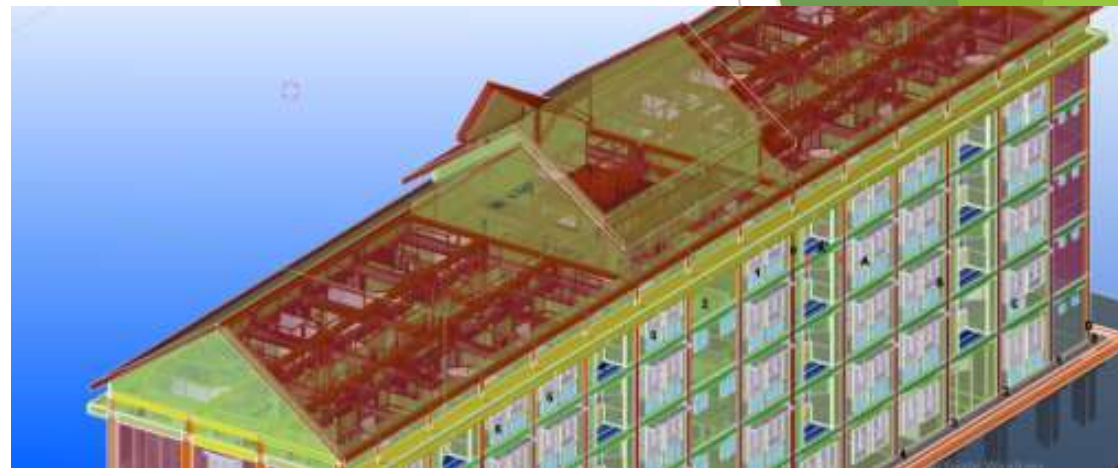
BIM Application in Precast Concrete Detailer in Low Cost Housing of Ministry of Public Works 1
